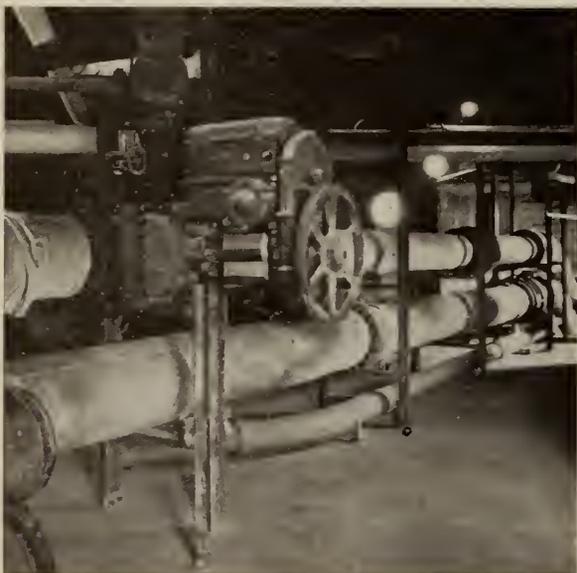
Twelve-inch Electrically Operated Steam Valve.
